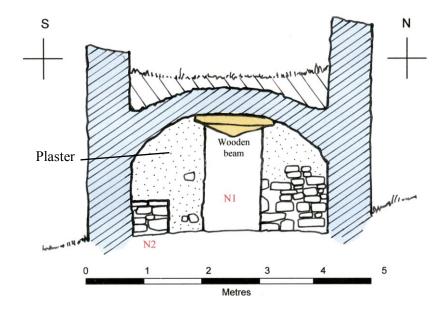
Section through south wing looking west at east face of central cross wall (1:75 scale)
